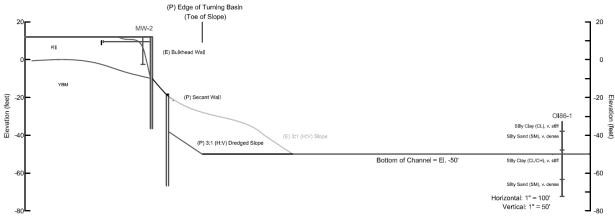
Schnitzer Steel Cross-Section C-C'(Proposed)
